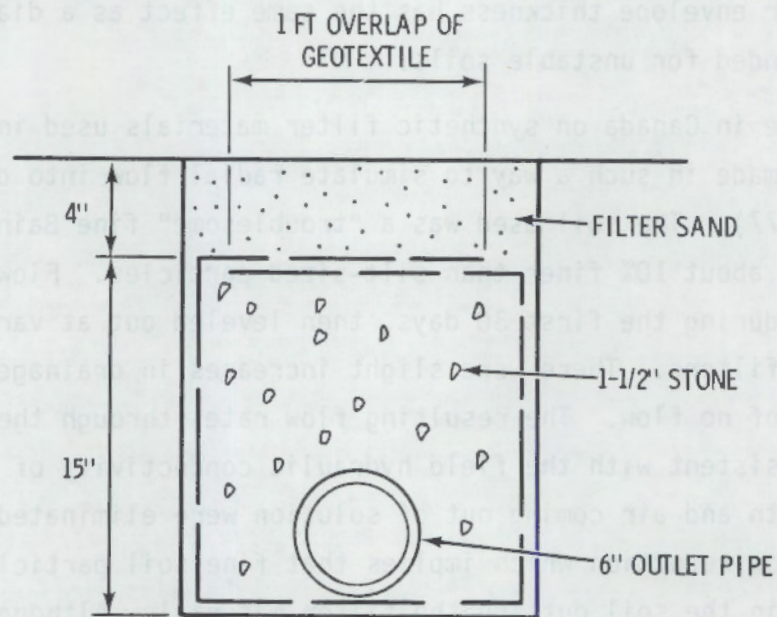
Typical Drain Detail (Van Zyl and Robertson 1980)
